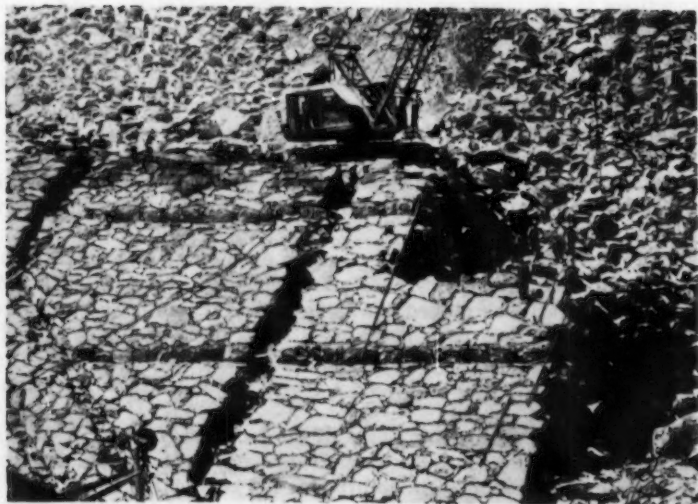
CRANE PLACED ROCK. DETAIL.
